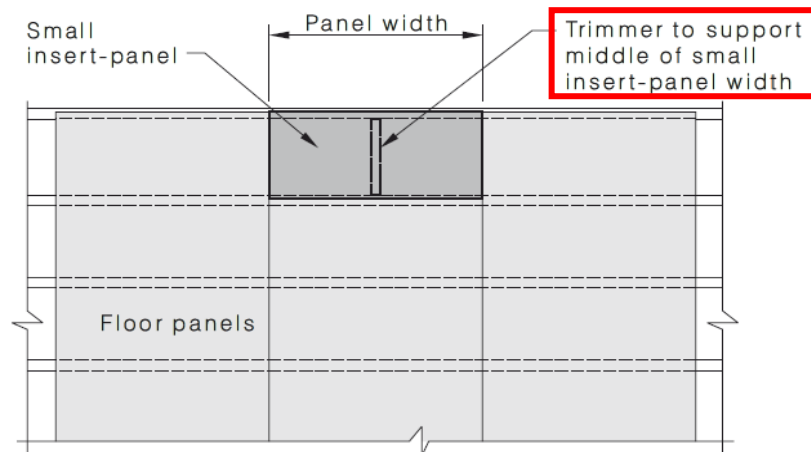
PANEL SPANNING TWO JOISTS ONLY—
